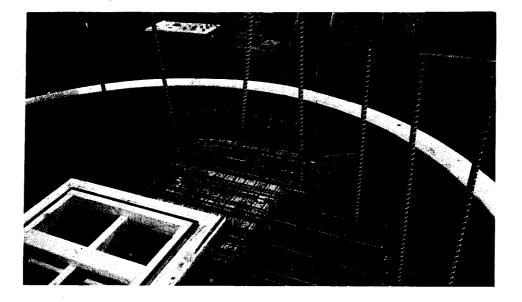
Base Reinforcement Prior to Placing Top Layer and Hinge Reinforcement
